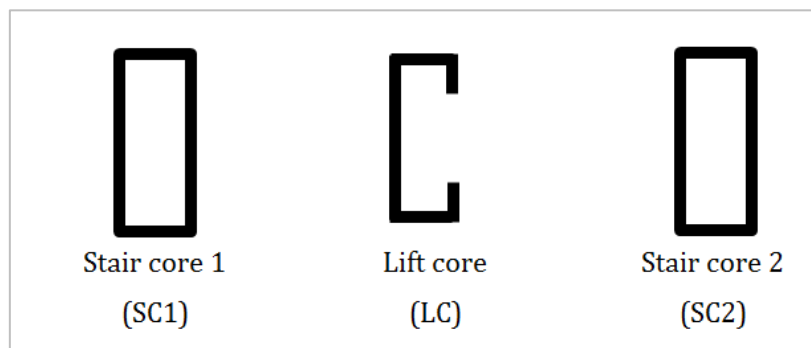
Schematic showing plan configuration of interconnected core walls
